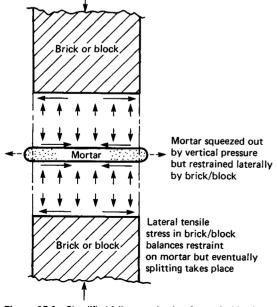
Simplified failure mechanism for vertical loads on masonry
